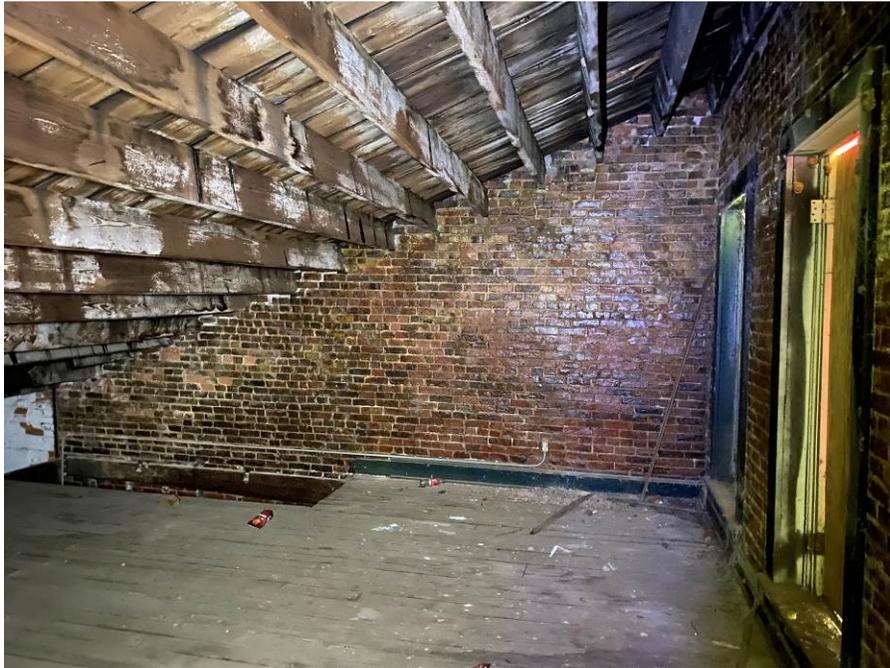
Water Stains on Roof Framing Members on 88 North Main
